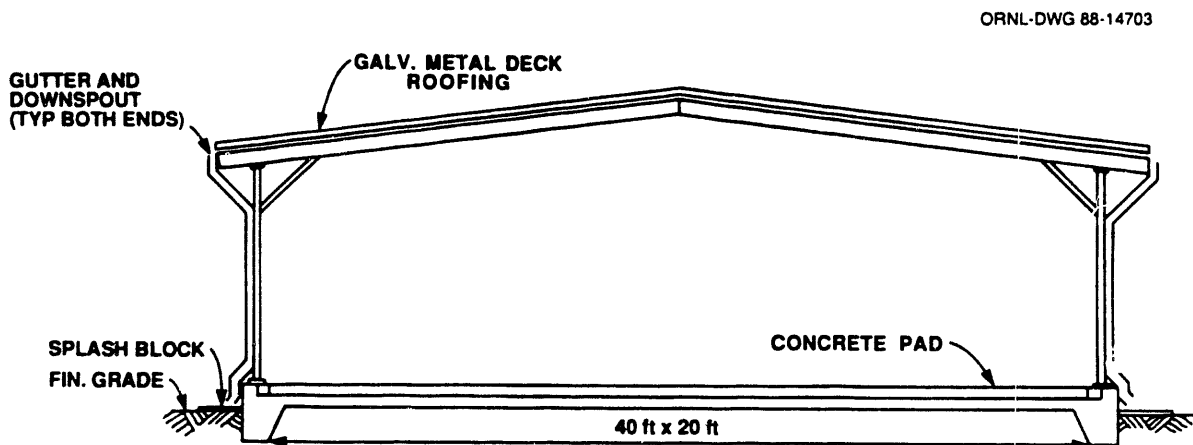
Layout of the Clean Oil Storage Pad (Building 7651).
